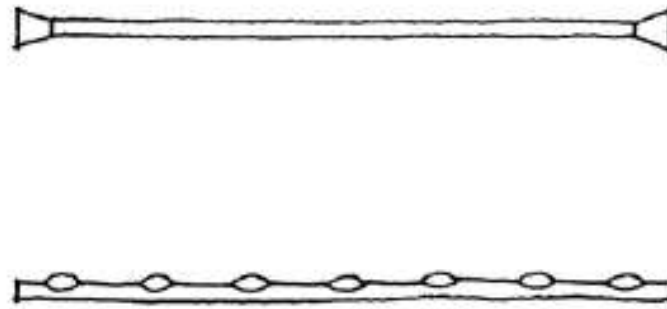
Coned and Mechanically Deformed Steel Fibres
